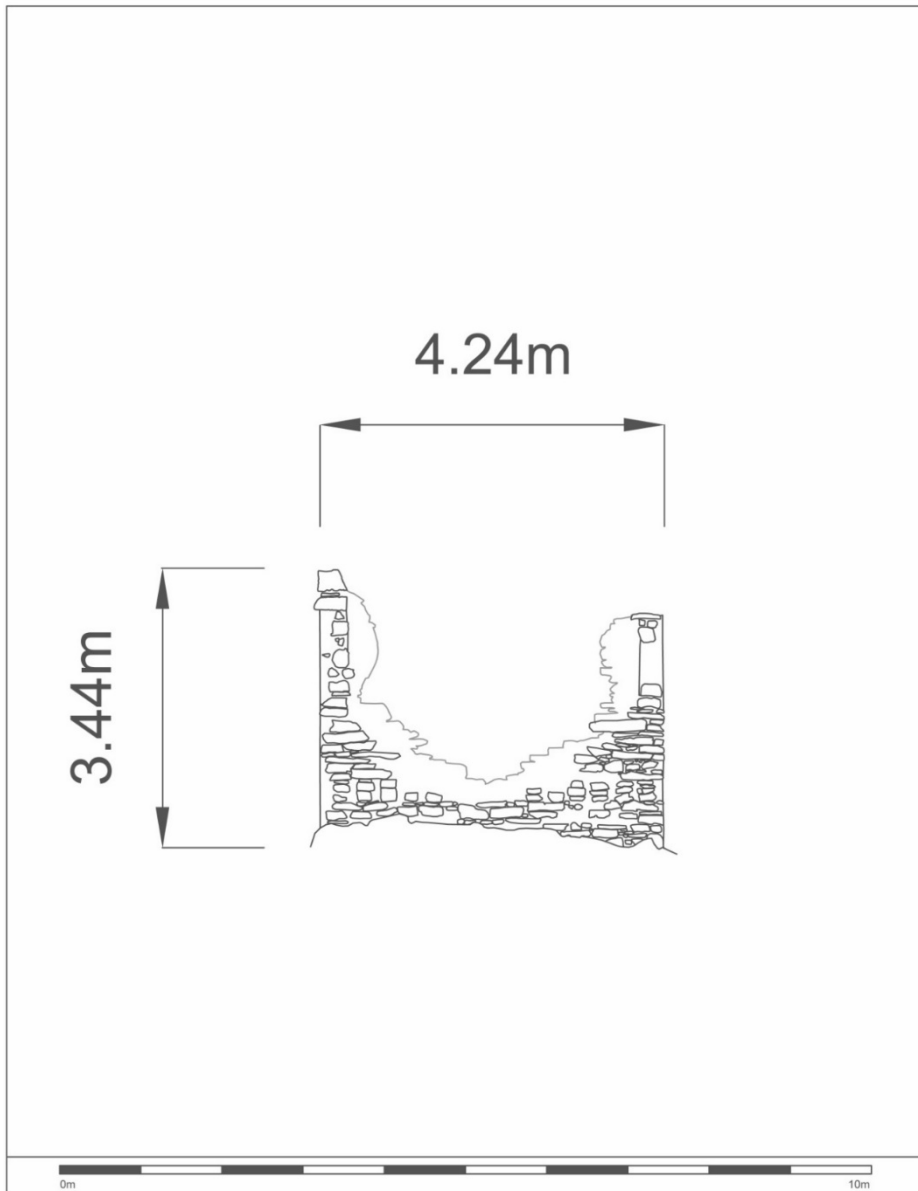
Internal elevation of the north wall of Saddle Hill Signal Tower.
